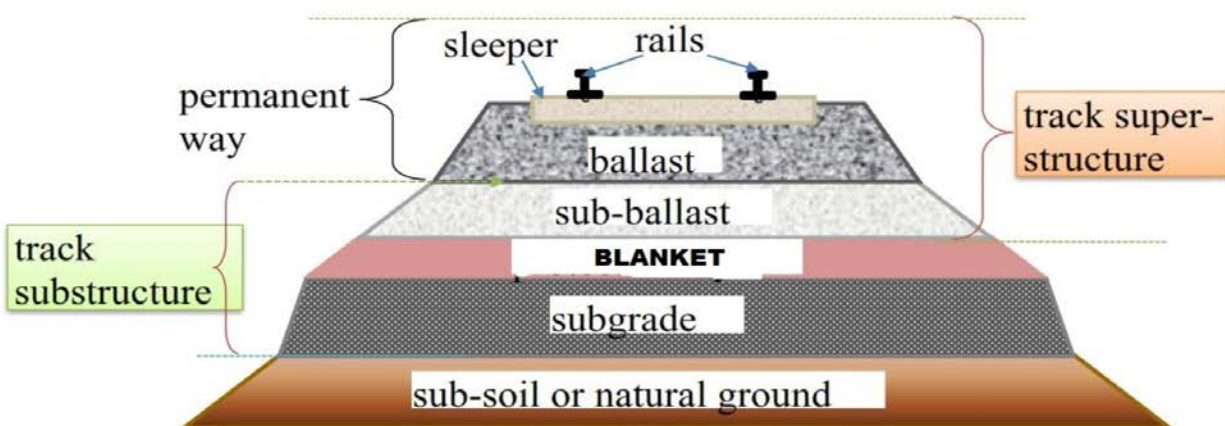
A typical Railway Embankment with a Bituminous Blanket, [42]
